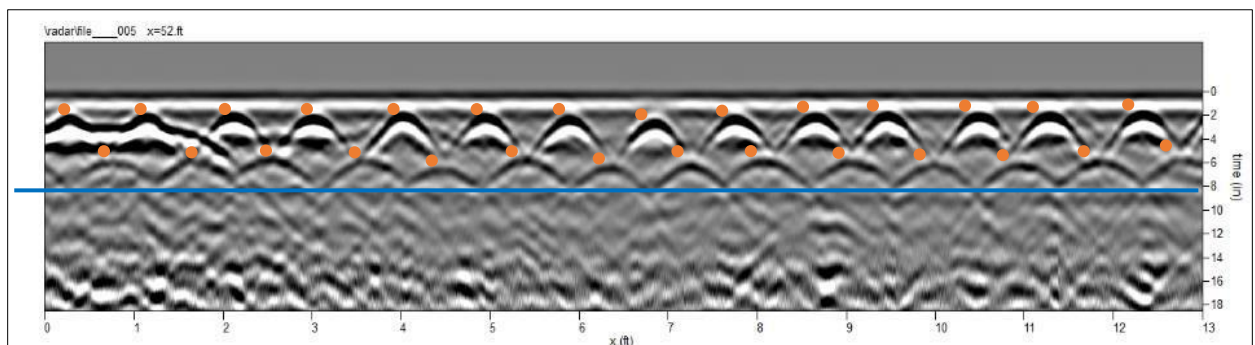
Example GPR scan from Abutment 5 (Line 5). Shows rebar locations and possible location of girder
